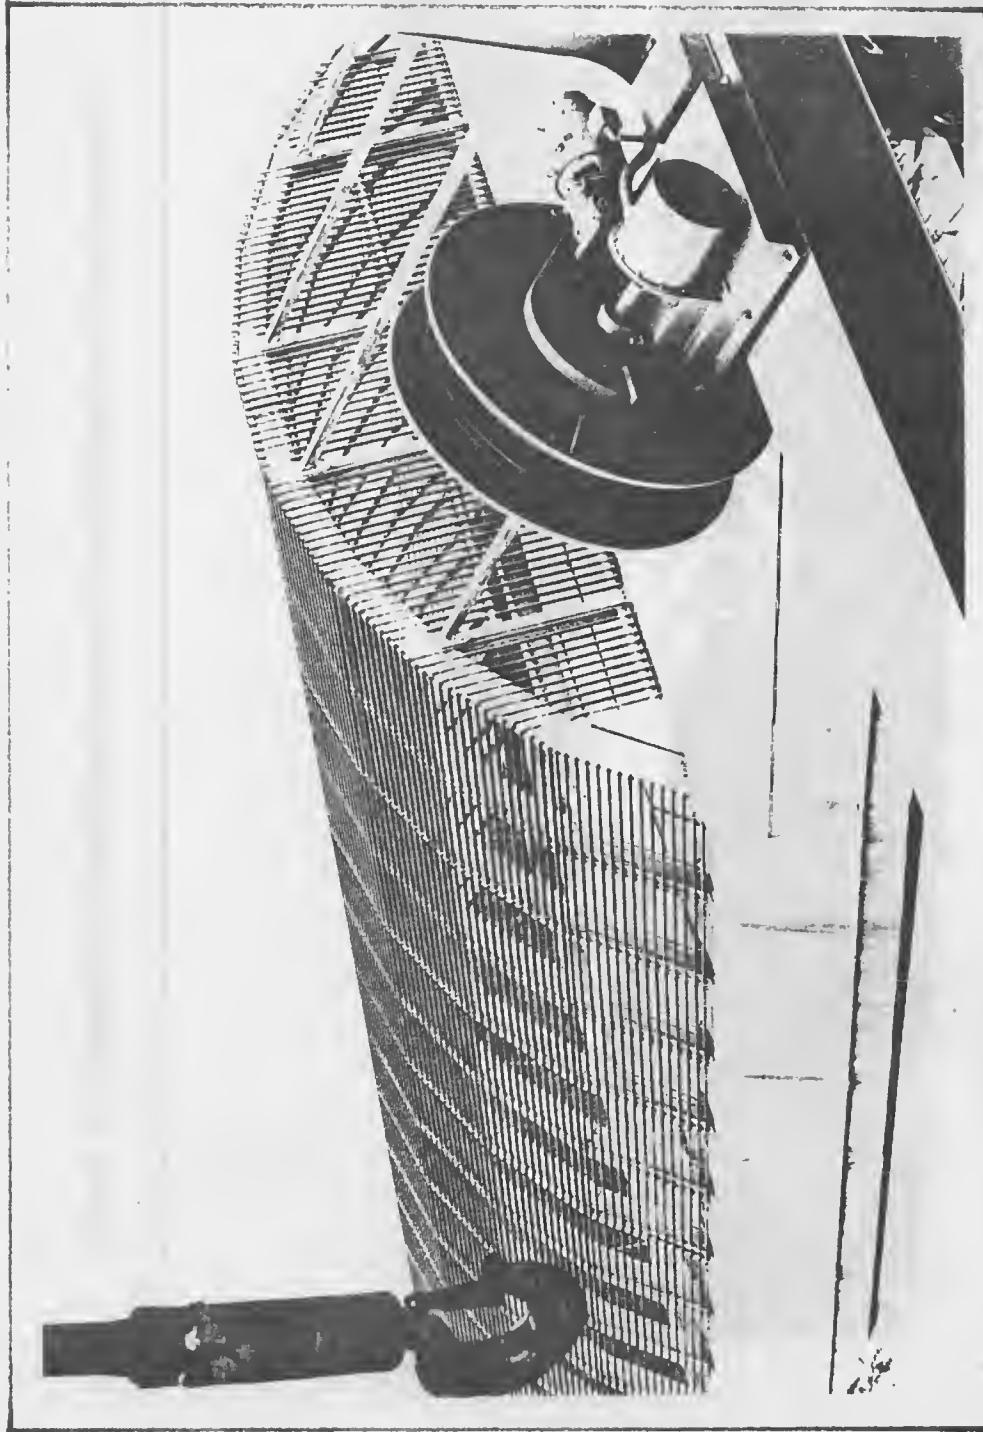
(Photograph) Trashrack Installation Detail Showing Top of Intake Channel
